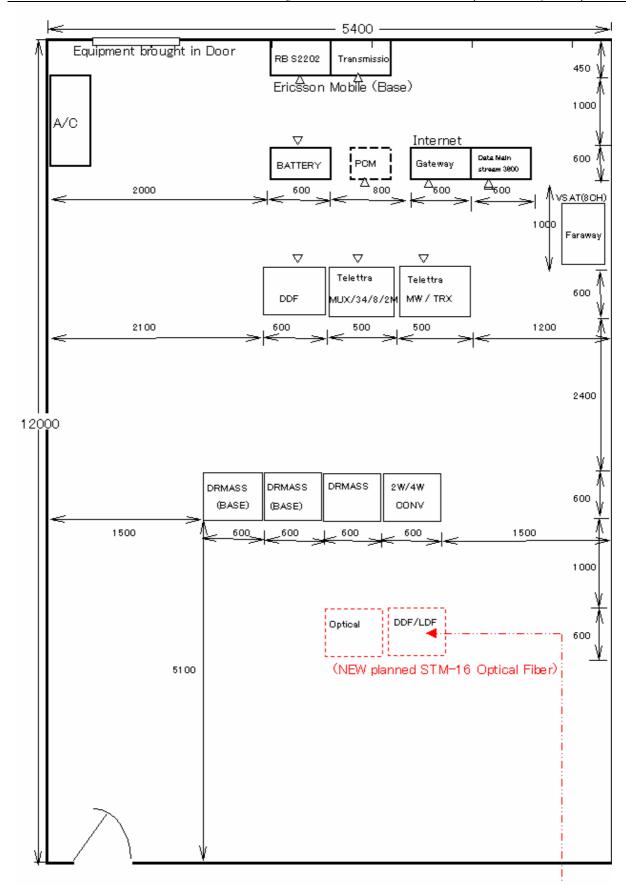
Radio/Mux Room Planned Installation Place (Nazareth P.C.)
